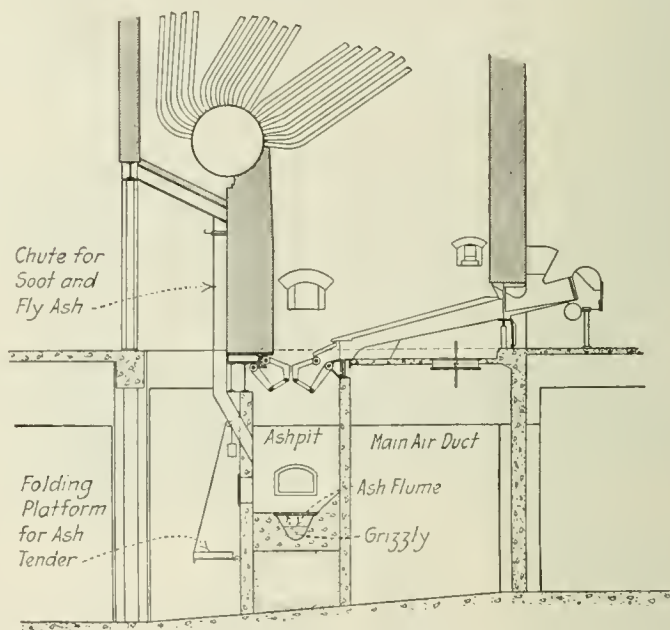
WATER CONVEYOR AT LACOMBE STATION, DENVER. CROSS-SECTIONAL ELEVATION
